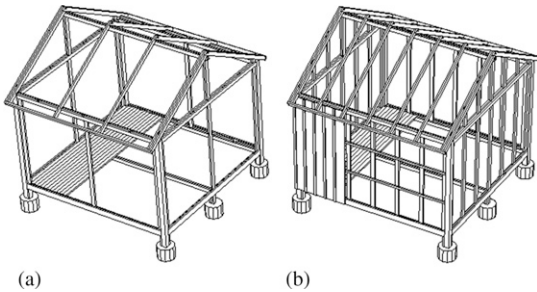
(a) Initial transitional skeleton tent frame constructed with built-up mortise and tenon joints; (b) drawing of structure after additional rafters, studs, and horizontal nailers have been added and partial vertical siding applied.
